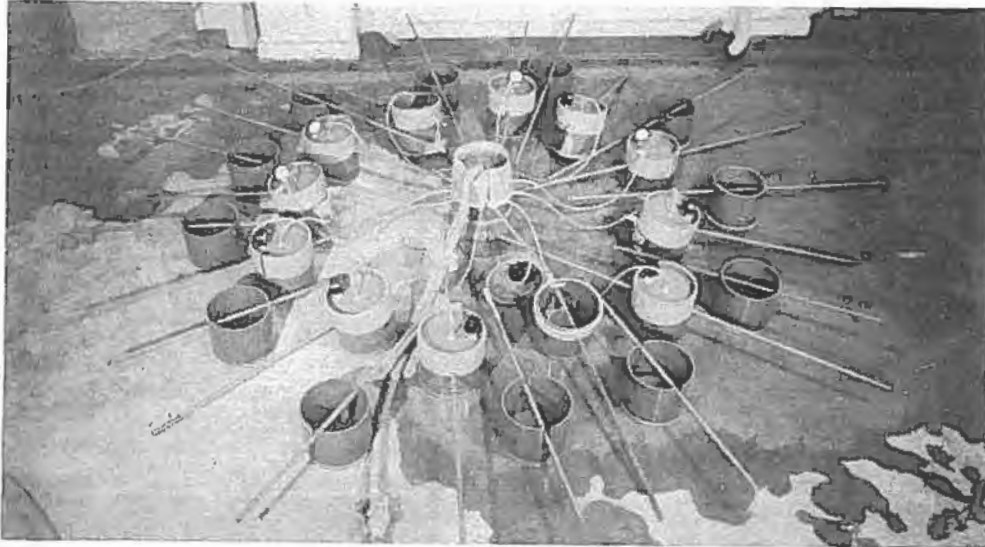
Arrangement of vacuum treated and reference moulds just before casting.
